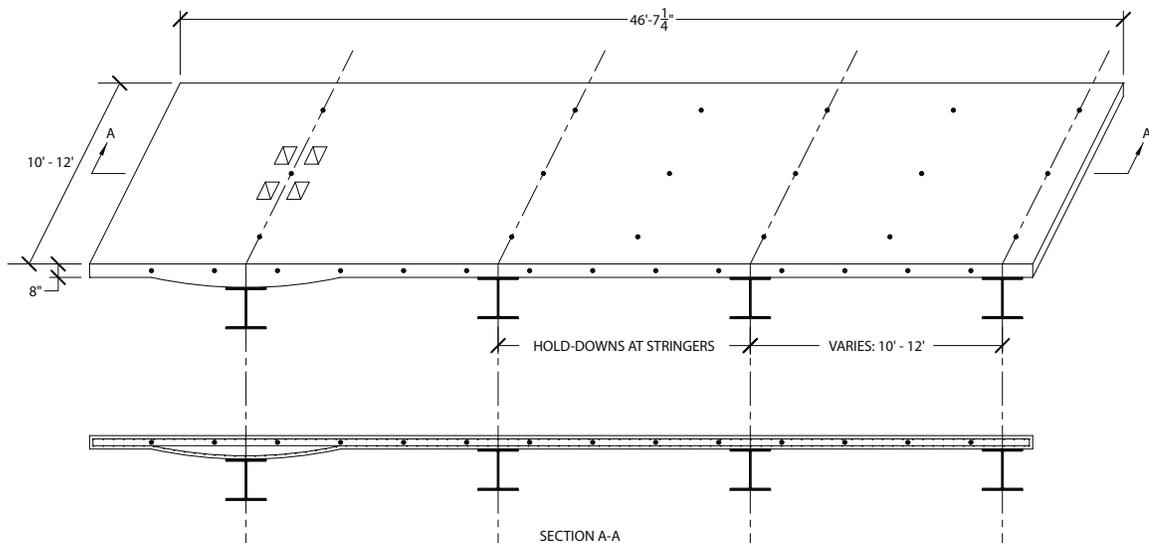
Typical panel for Woodrow Wilson Bridge.
